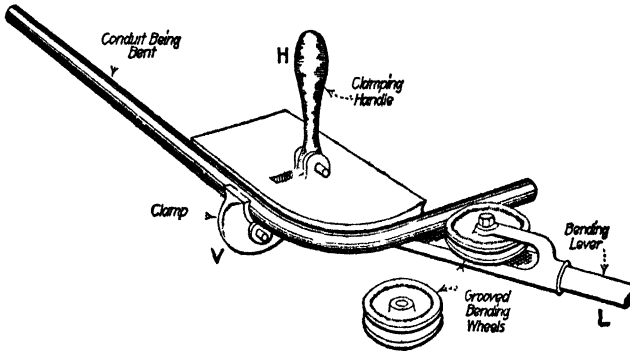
A typical commercial roll bender for conduit work. (Thomas & Betts, New York City)
